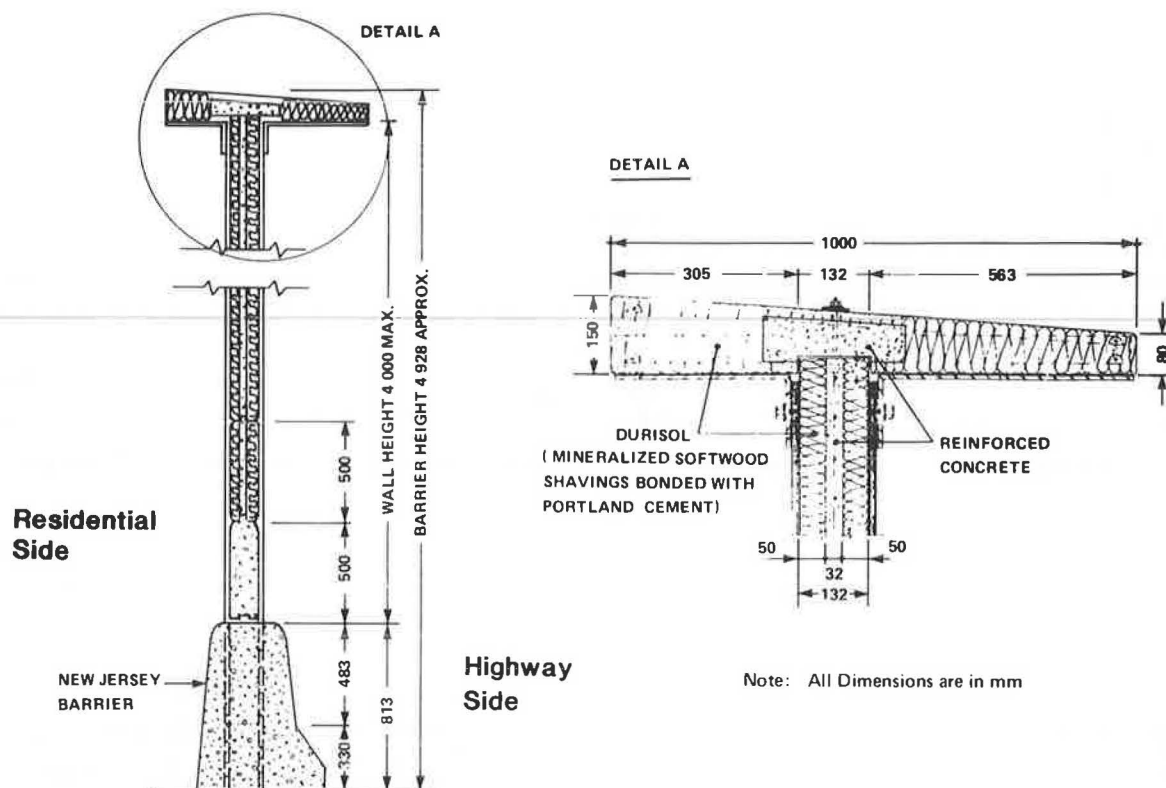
Construction details of T-profile noise barrier mounted on NJ wall.
